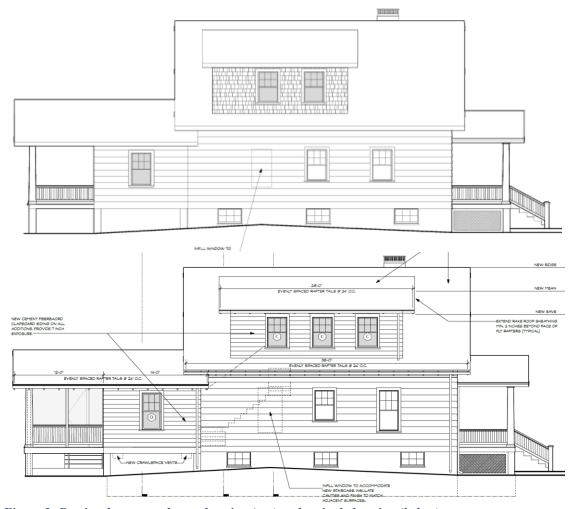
Previously approved east elevation (top) and revised elevation (below).
